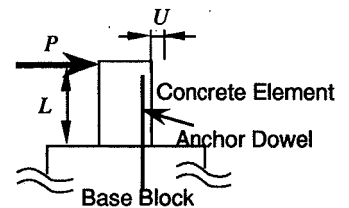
Loading Test Model (Reinforced Concrete Pier)
